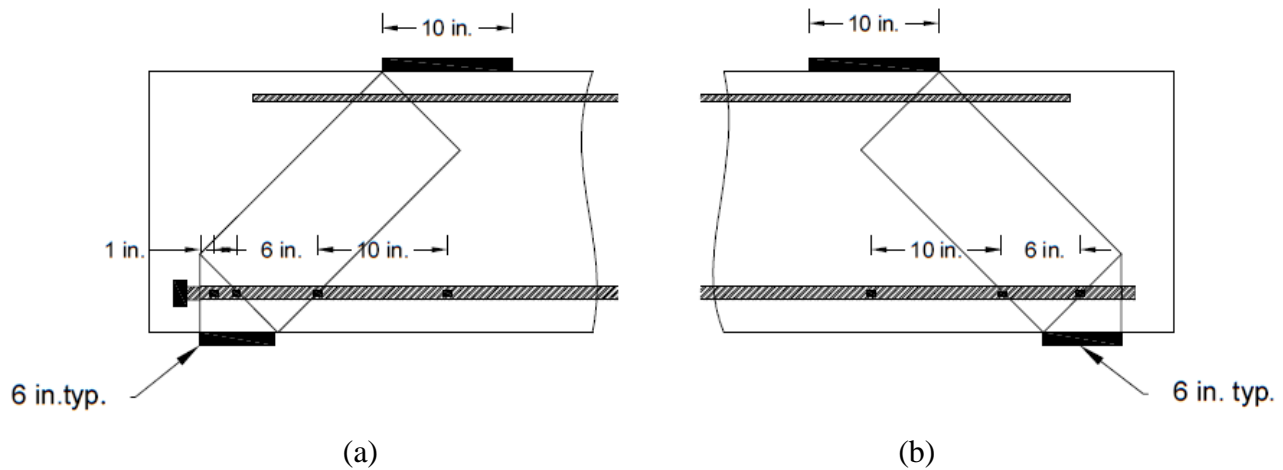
Placement of strain gauges for a typical specimen (a) headed end, (b) non-headed end
